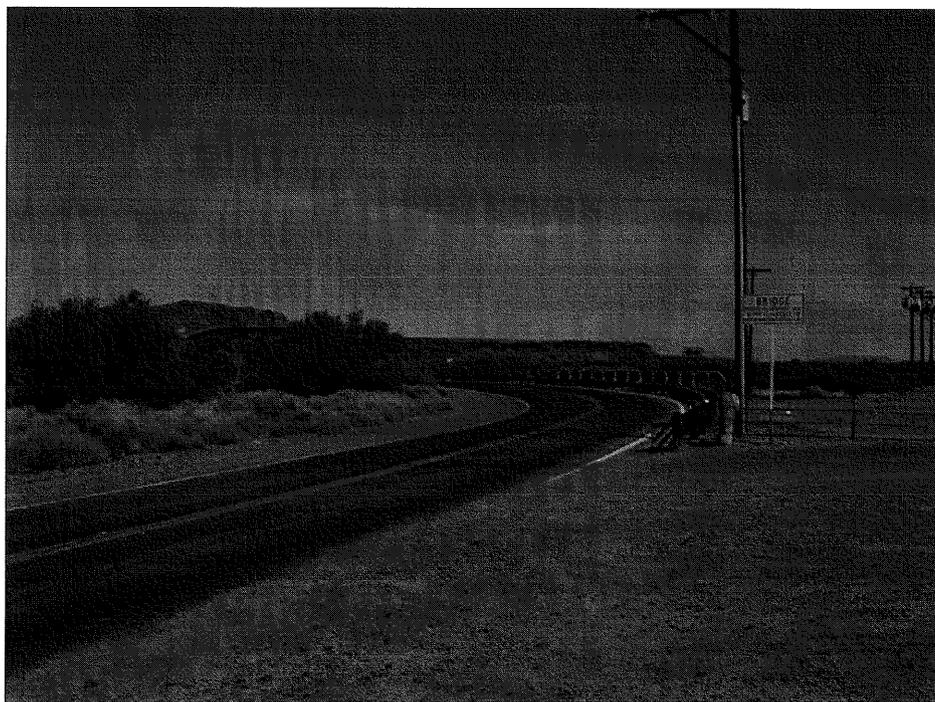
Photograph of Road Segment 3 (east side of river), AZ FF:9:17(ASM), facing northwest towards the curve to Gillespie Dam Bridge.
